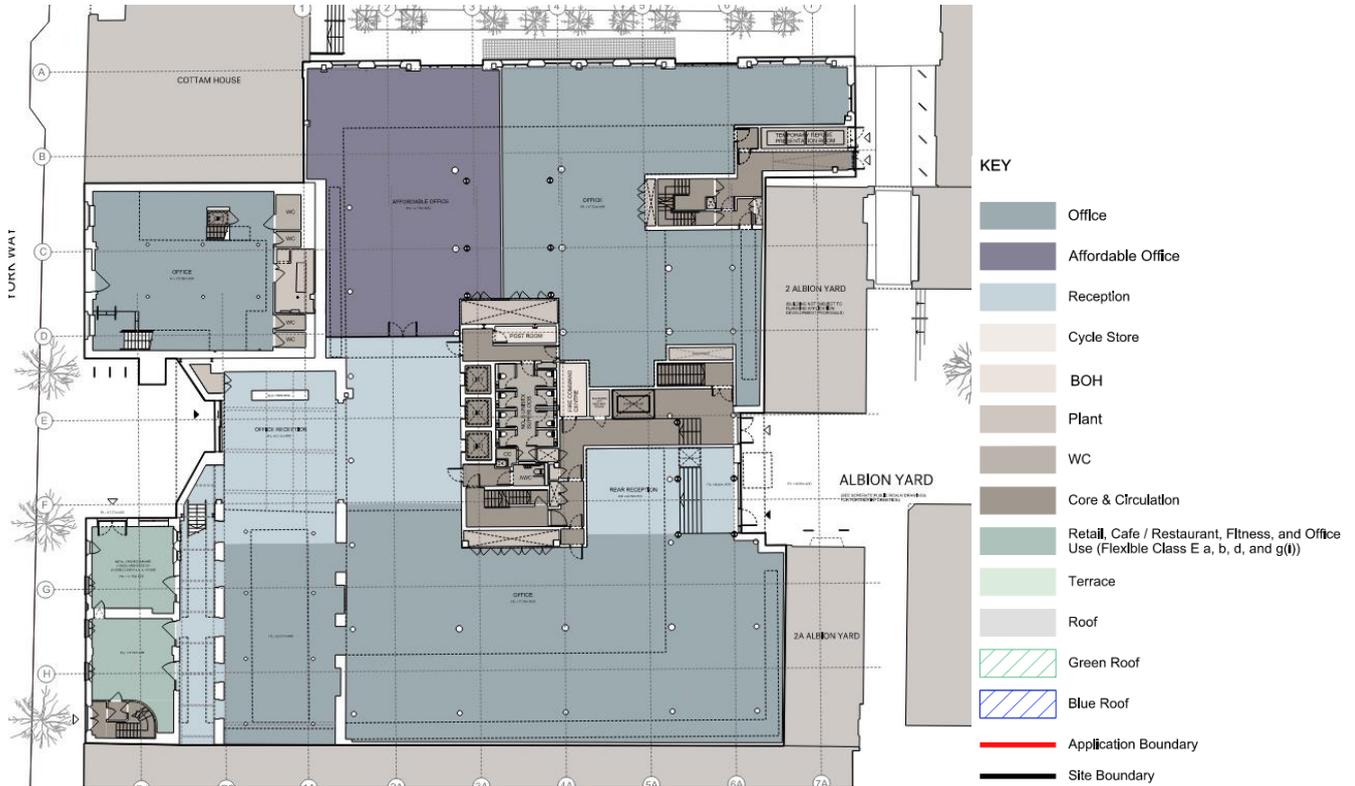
Revised proposed ground floor plan – Provision of Affordable Workspace
